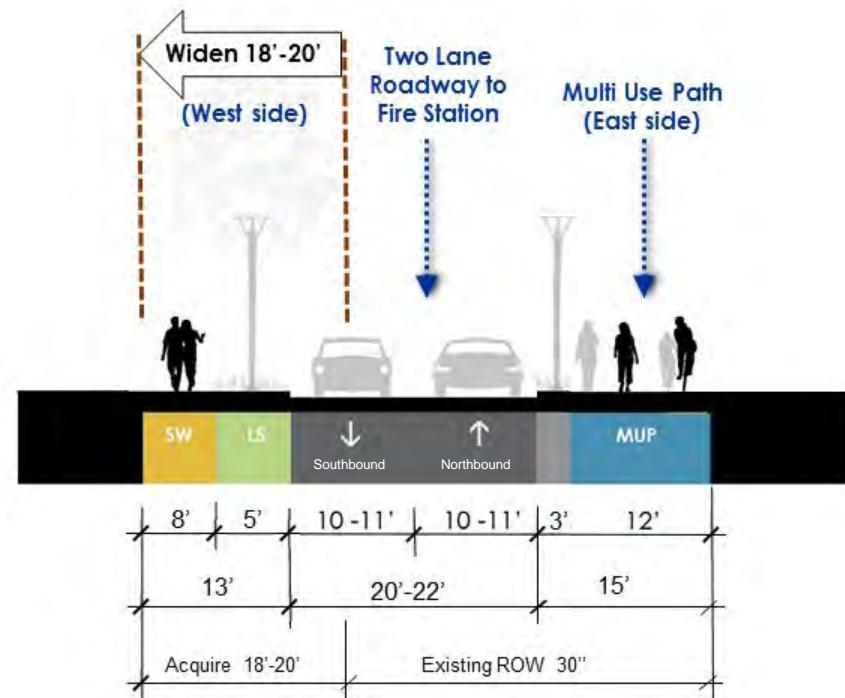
Typical Section Hartford Dr. Segment 1 (Grade Rd. to 21st St. NE)
